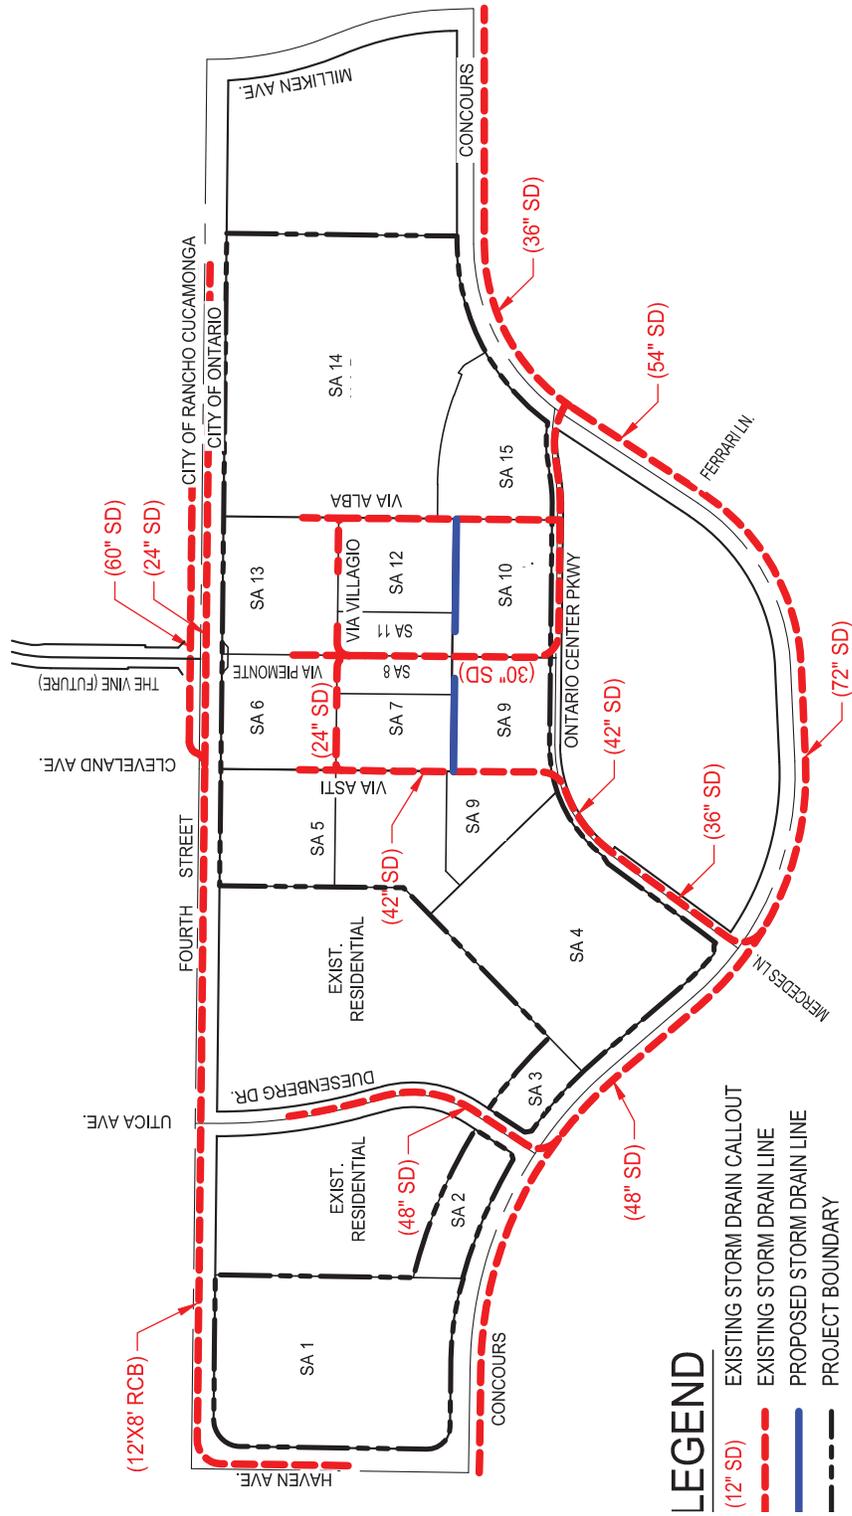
Storm Water Collection and Conveyance Facilities Plan
